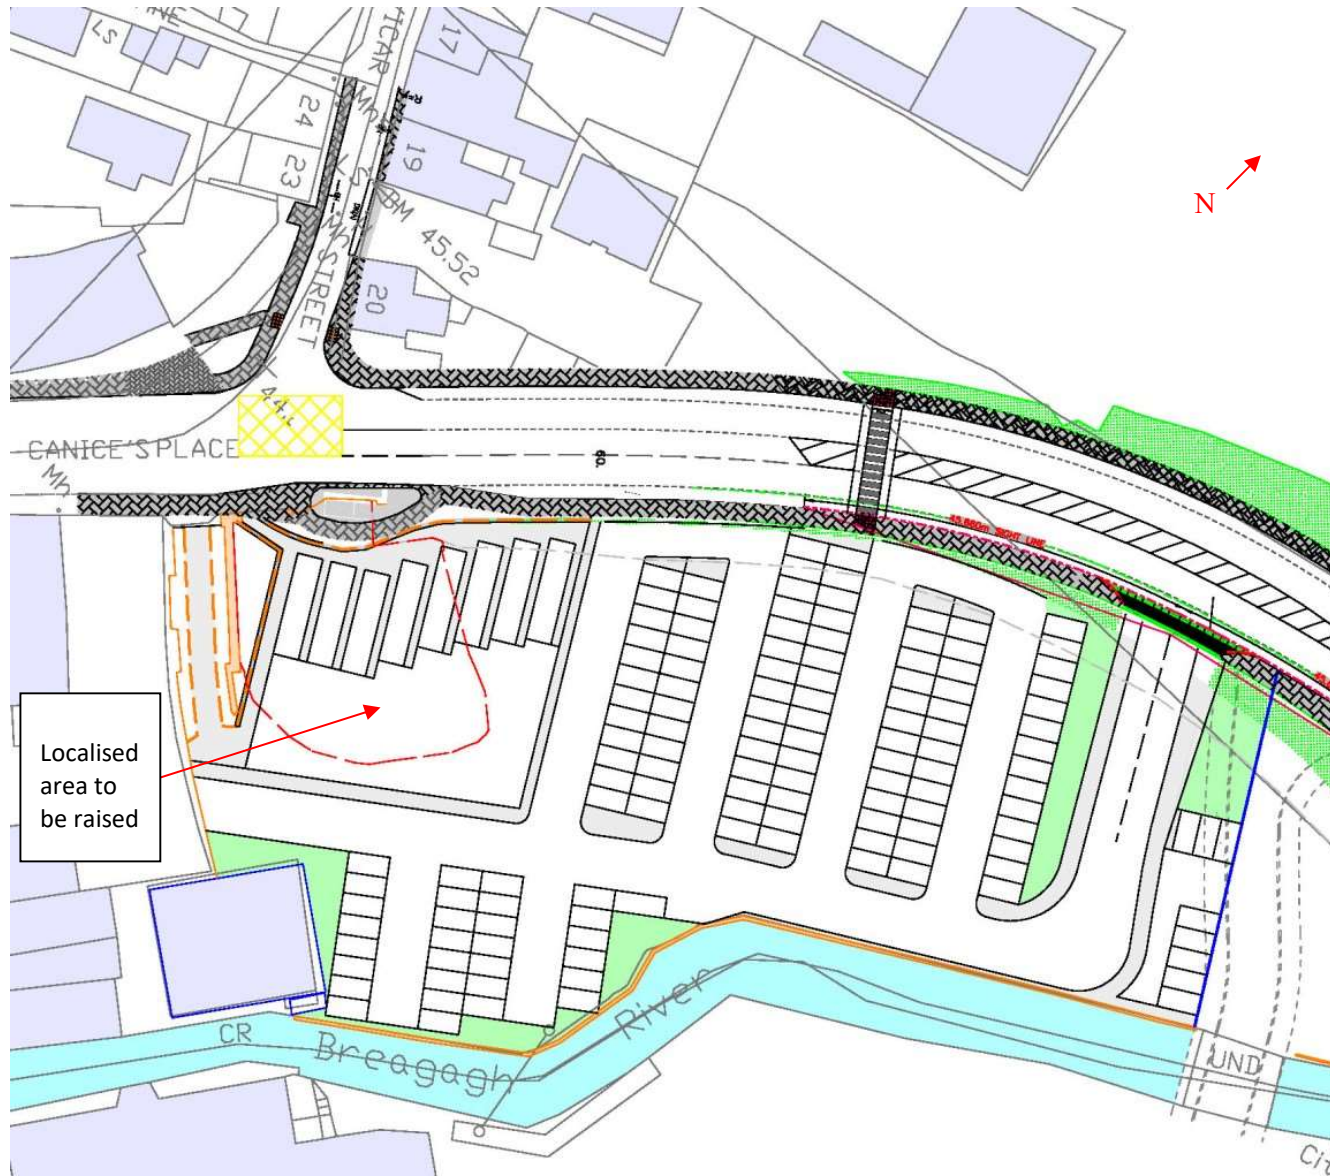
Plan showing location of proposed Temporary Coach/Car Park.
